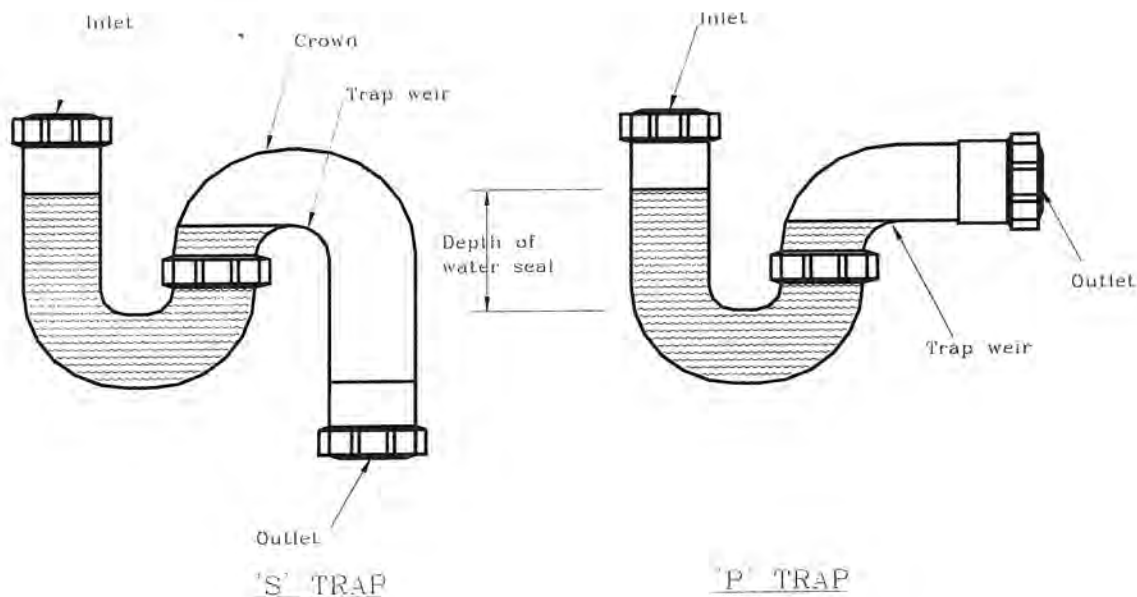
EXAMPLES OF FIXTURE TRAPS
